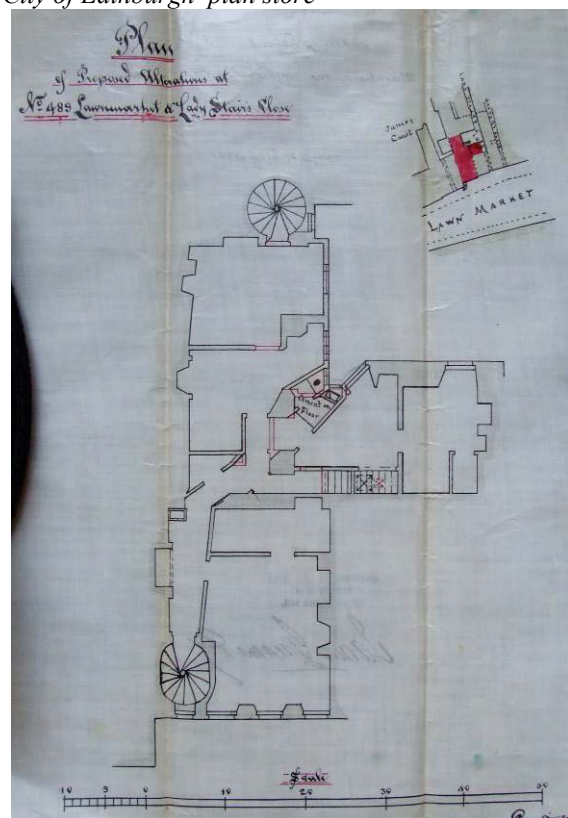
Plan showing warranted alterations scheme for second floor and roof light from floors above. Application dated 25th July 1889. City of Edinburgh plan store
